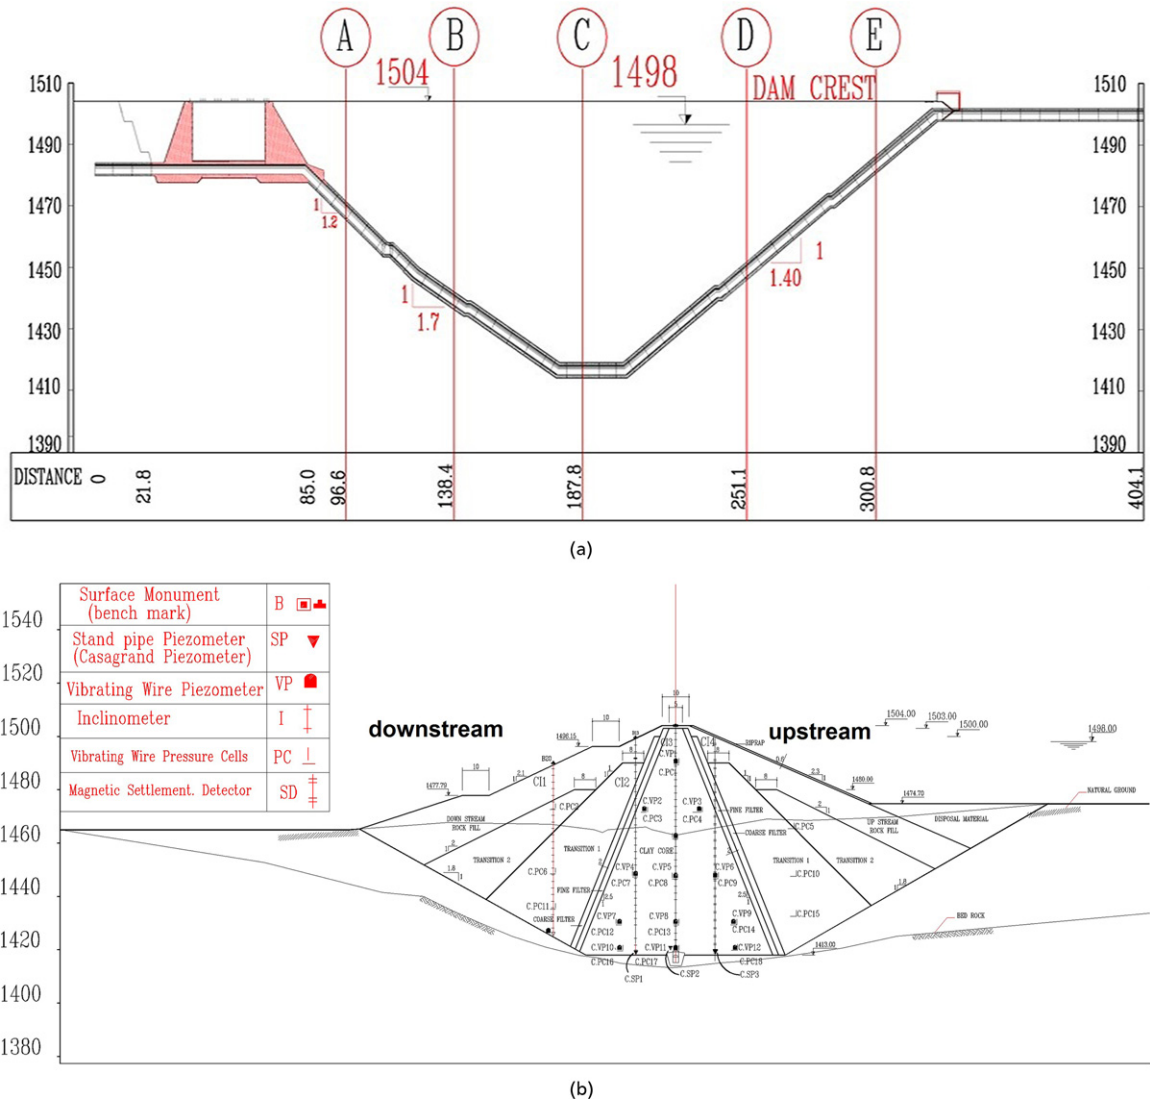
Madani dam: (a) dam longitudinal section and (b) largest cross-section
